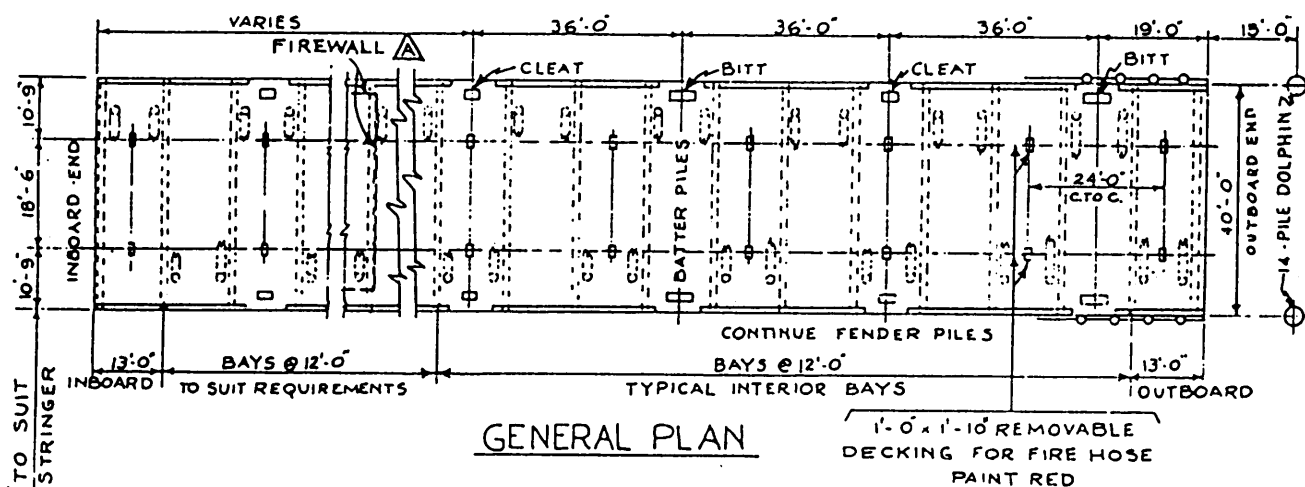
General plan of an advanced-base 40-foot timber pier.
